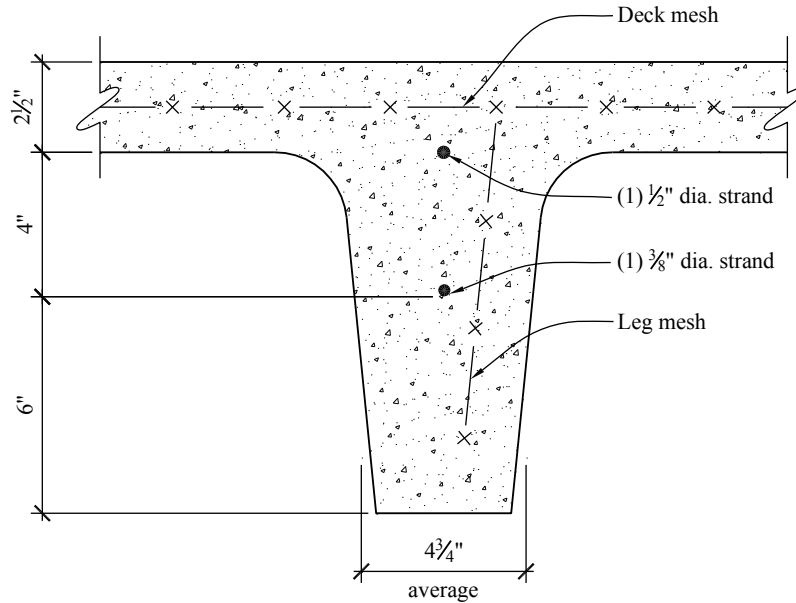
Cross section of one DT leg showing the location of the bonded prestressing tendons or strand
